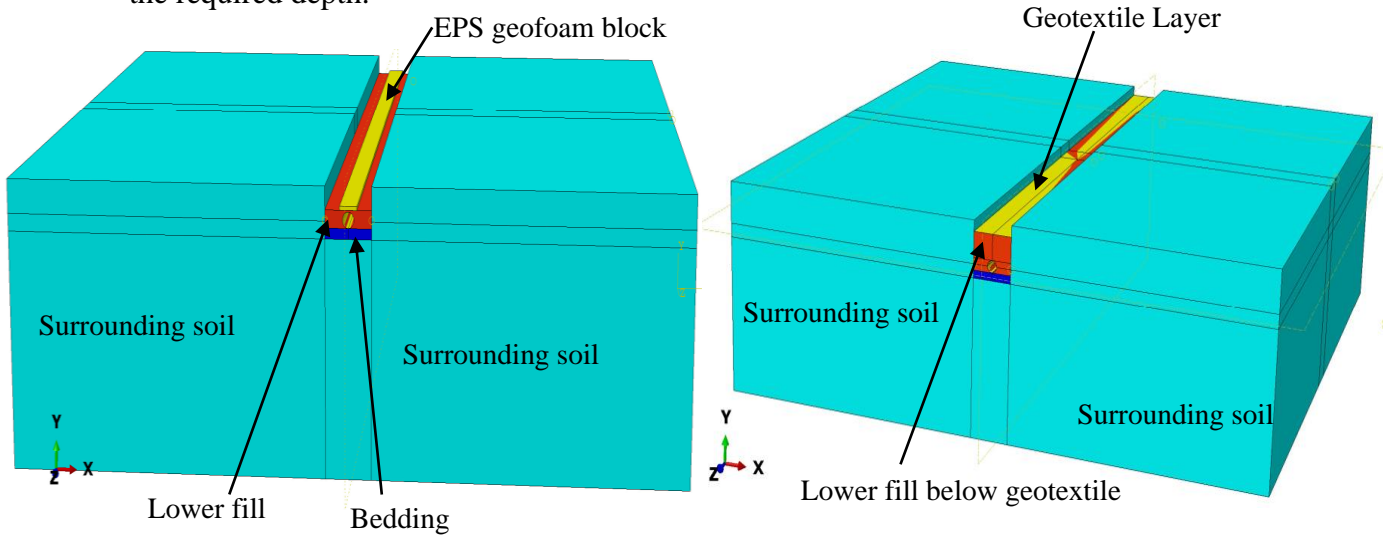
Installation of (a) EPS geofoam, (b) geotextile
